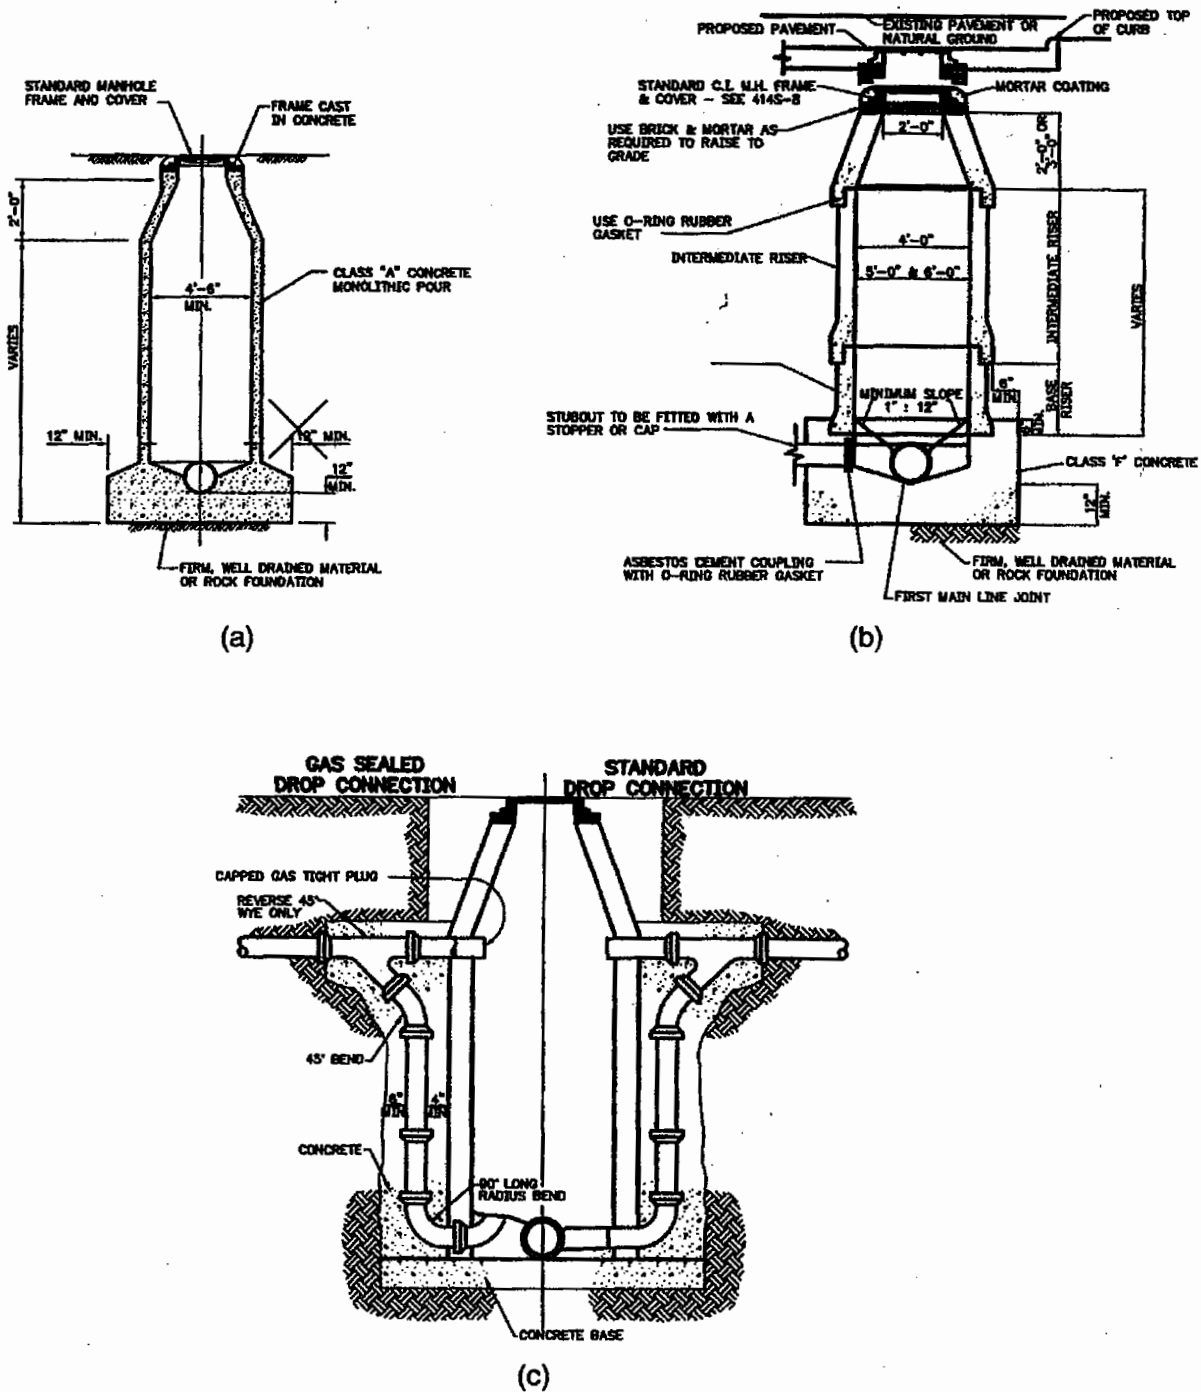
Typical Designs of Manholes: (a) standard cast-in-place manhole, (b) standard precast manhole, and (c) standard drop manhole connection (courtesy Chiang, Patel and Yerby, Inc.).
